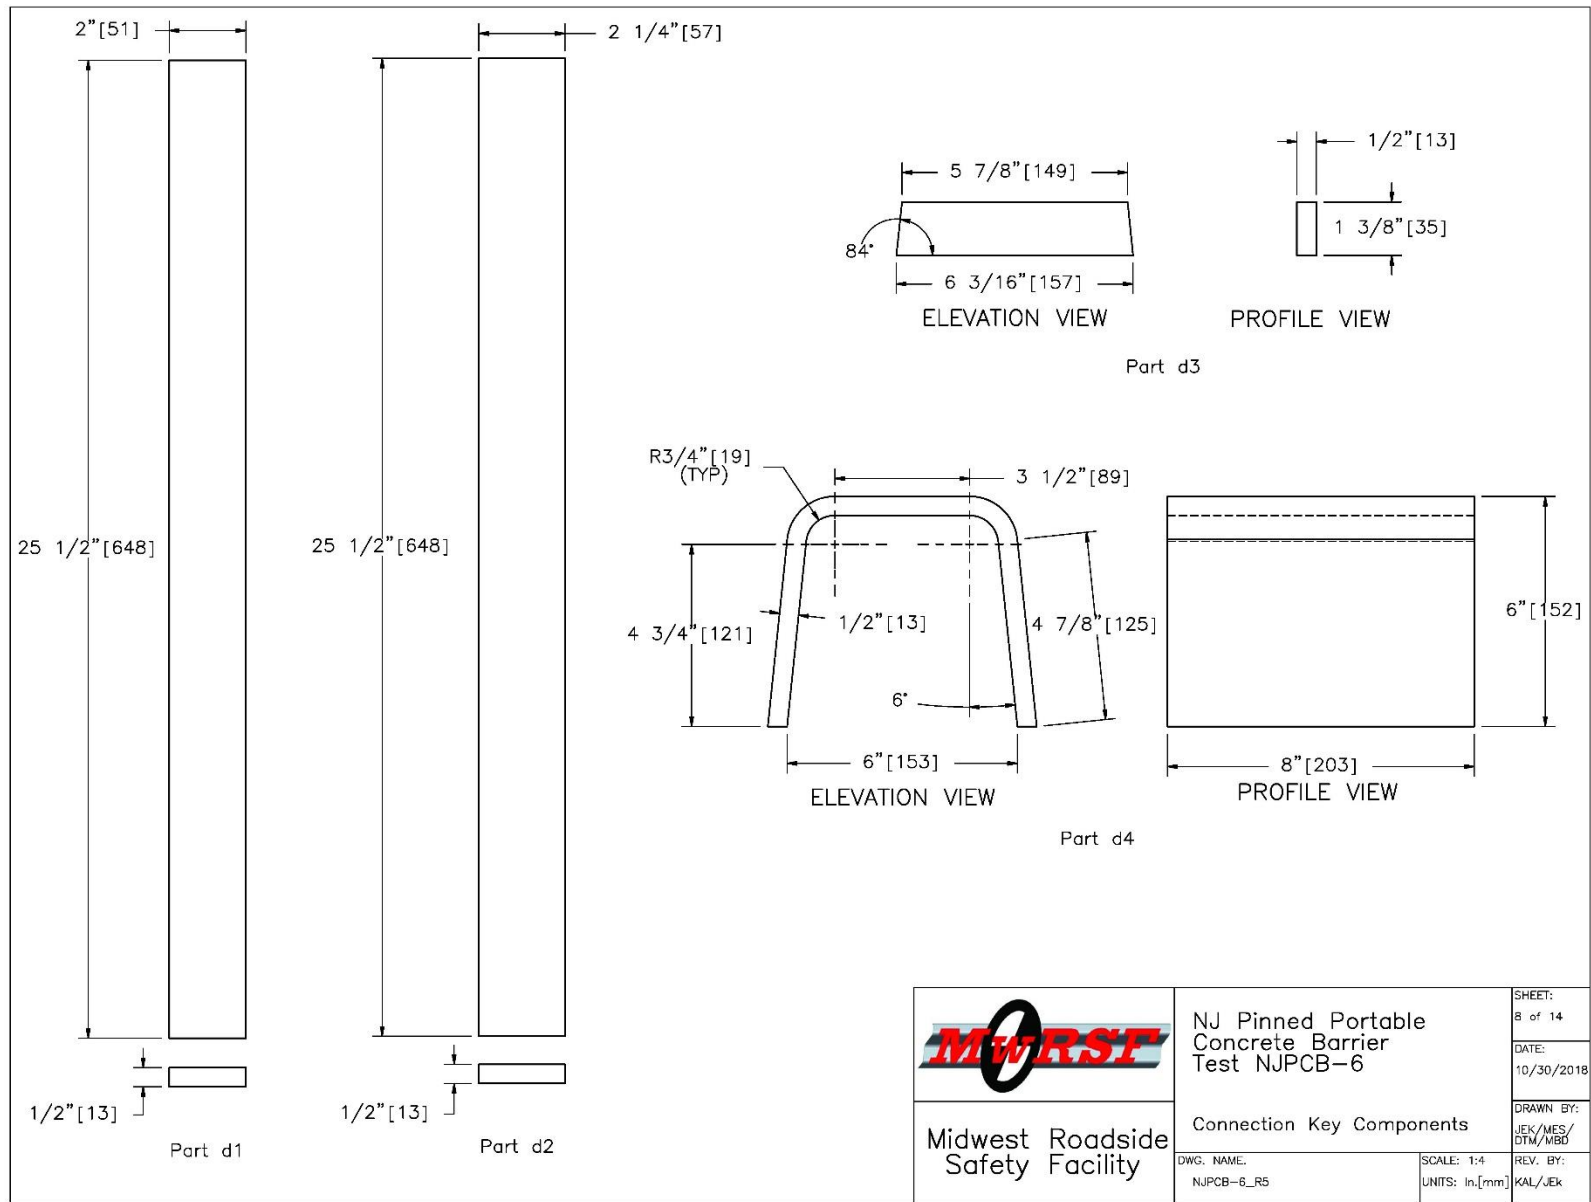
PCB Connection Key Component Details, Test No. NJPCB-6
